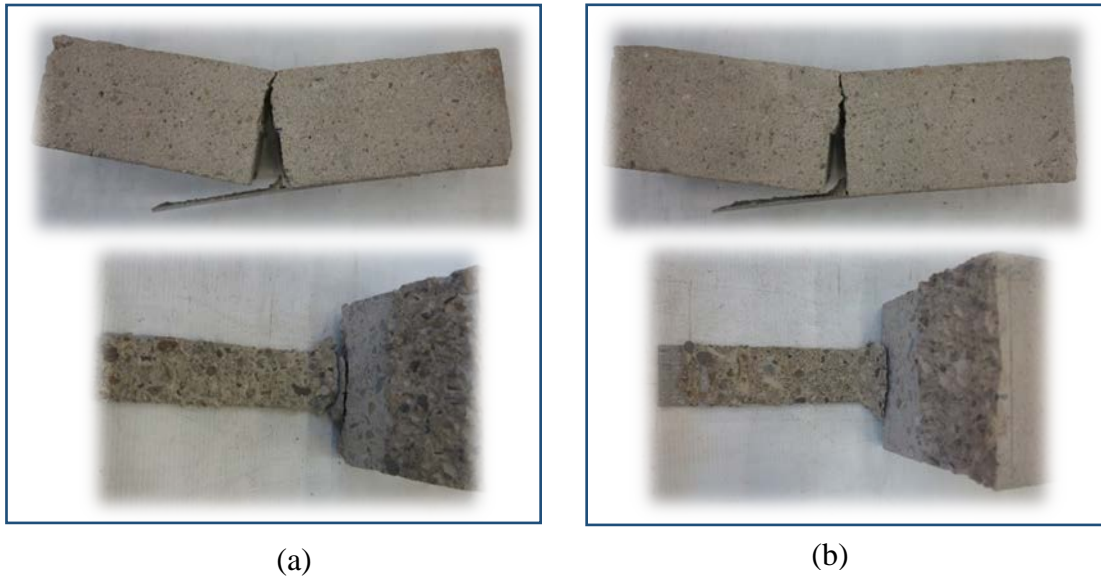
a) Failure mode for specimen TPB_400_50_MD_B_1. b) Failure mode for specimen TPB_400_50_HD_B_1.
